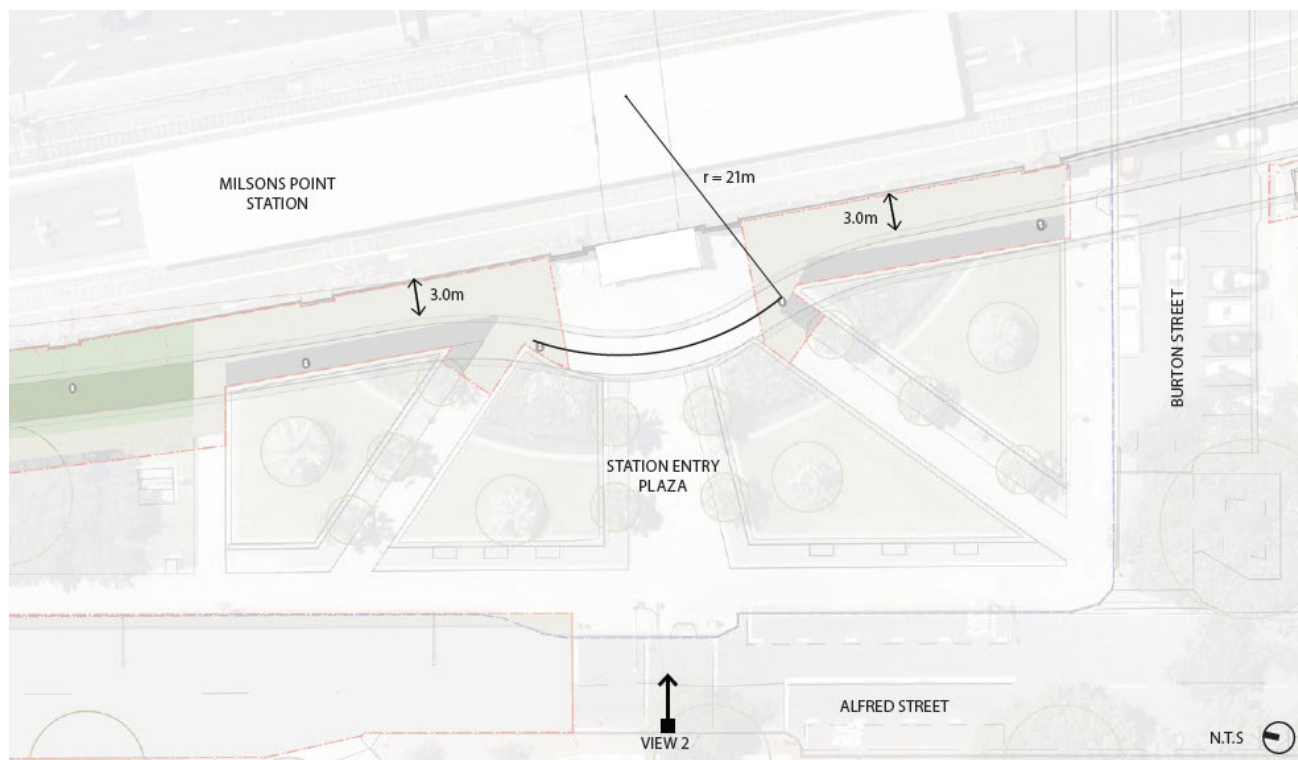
Concept design plan - Cycleway ramp arc at station entry (Source: ASPECT Studios)
